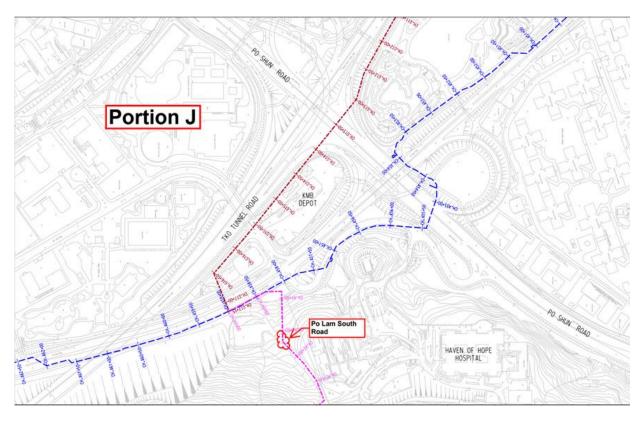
Location Plan for Mau Wu Tsai 1 (Po Lam South Road 1)
